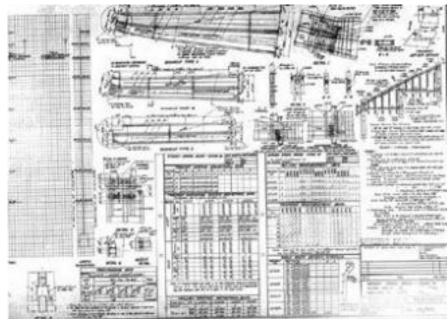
"SOD Construction Drawing" (Sabol, 2008).
